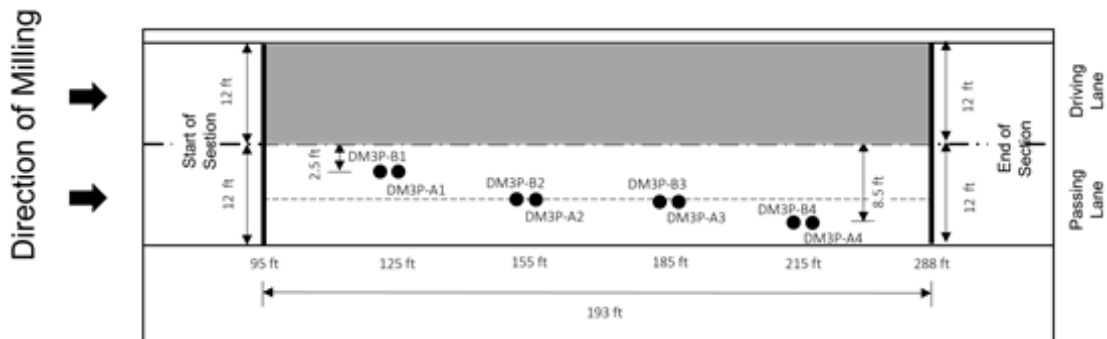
Cell 215 Sampling Plan (not to scale)
